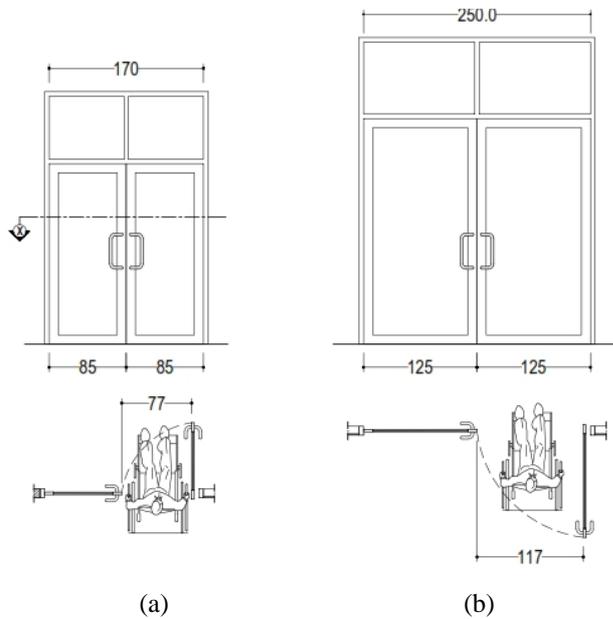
(a) COT Building and (b) Department Building entrance doors.
